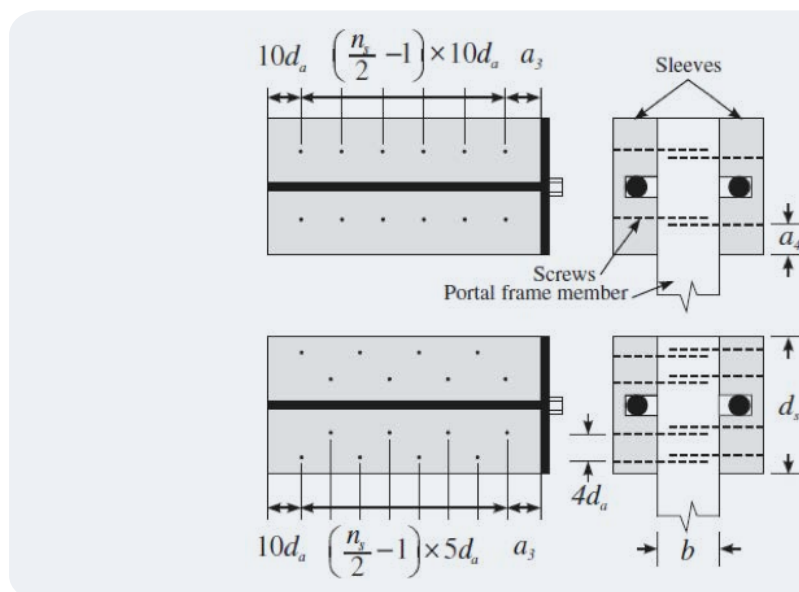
Screw spacing requirements for quick-connect connection side view.
